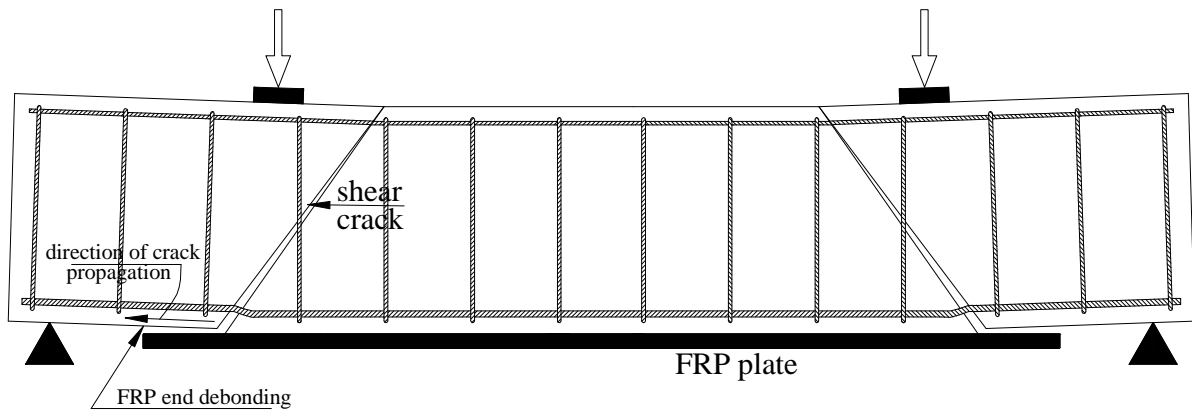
Shear crack induced plate end debonding failure mode.
